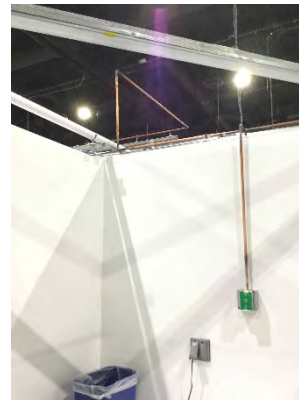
Completed Wall with O2 and Electrical Supply at Patient Pod
